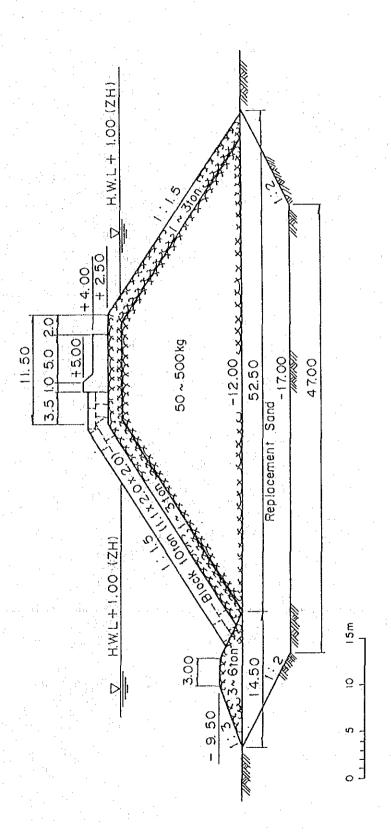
Typical Cross Section of West Sub Breakwater
